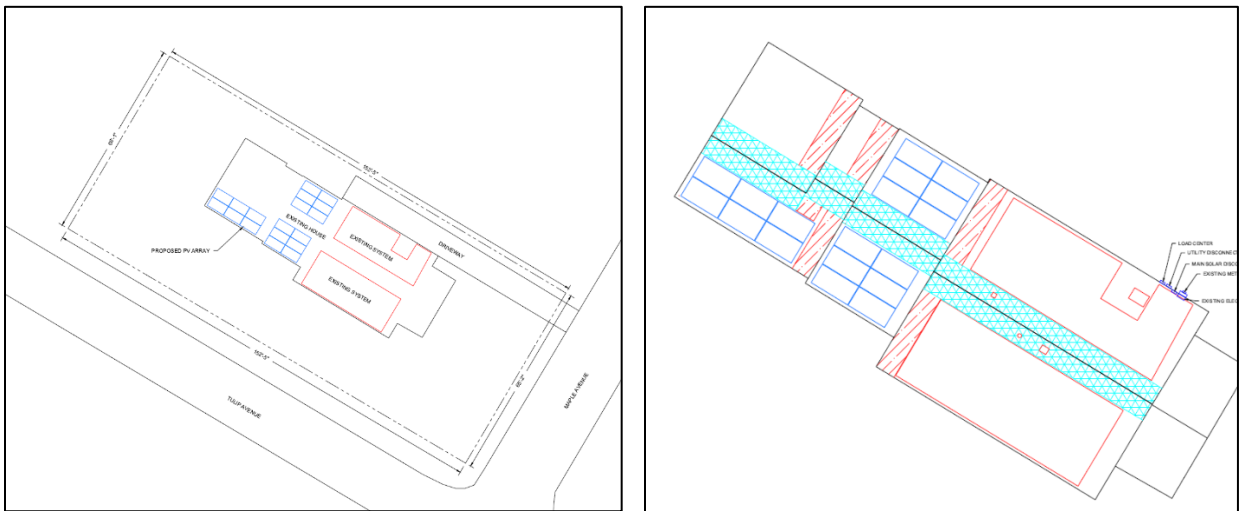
The site plan (left) shows the proposed solar panel locations and the building's relationship to the
